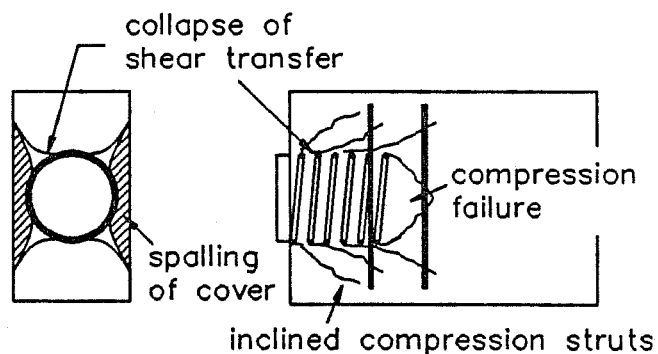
Failure of Concrete Surrounding the Confined Plug
